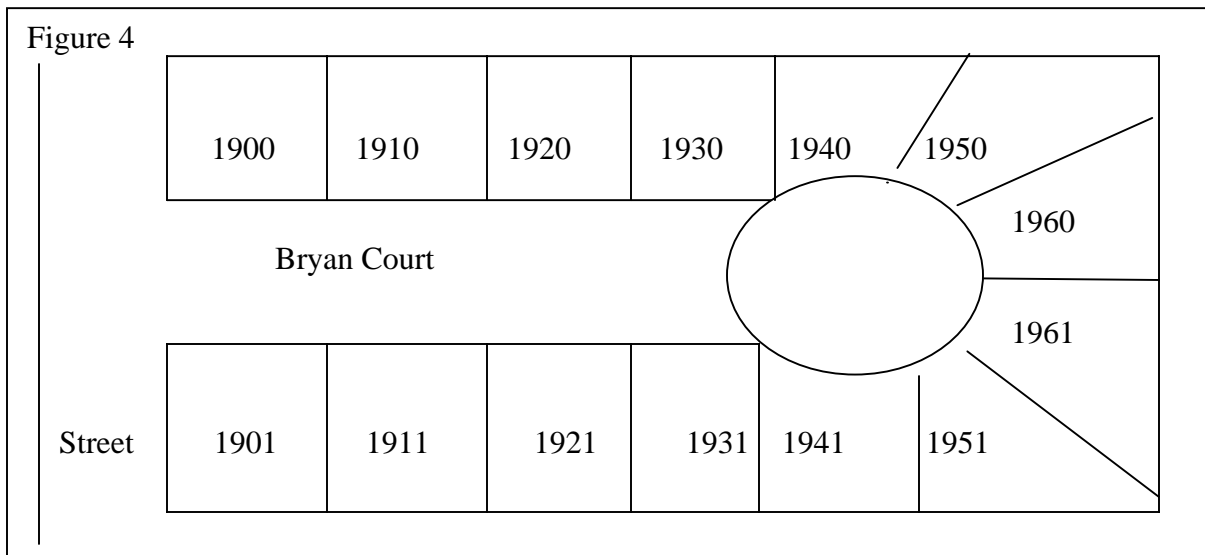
Typical cul-de-sac showing one roadway going in and circling around and existing to the main roadway.
